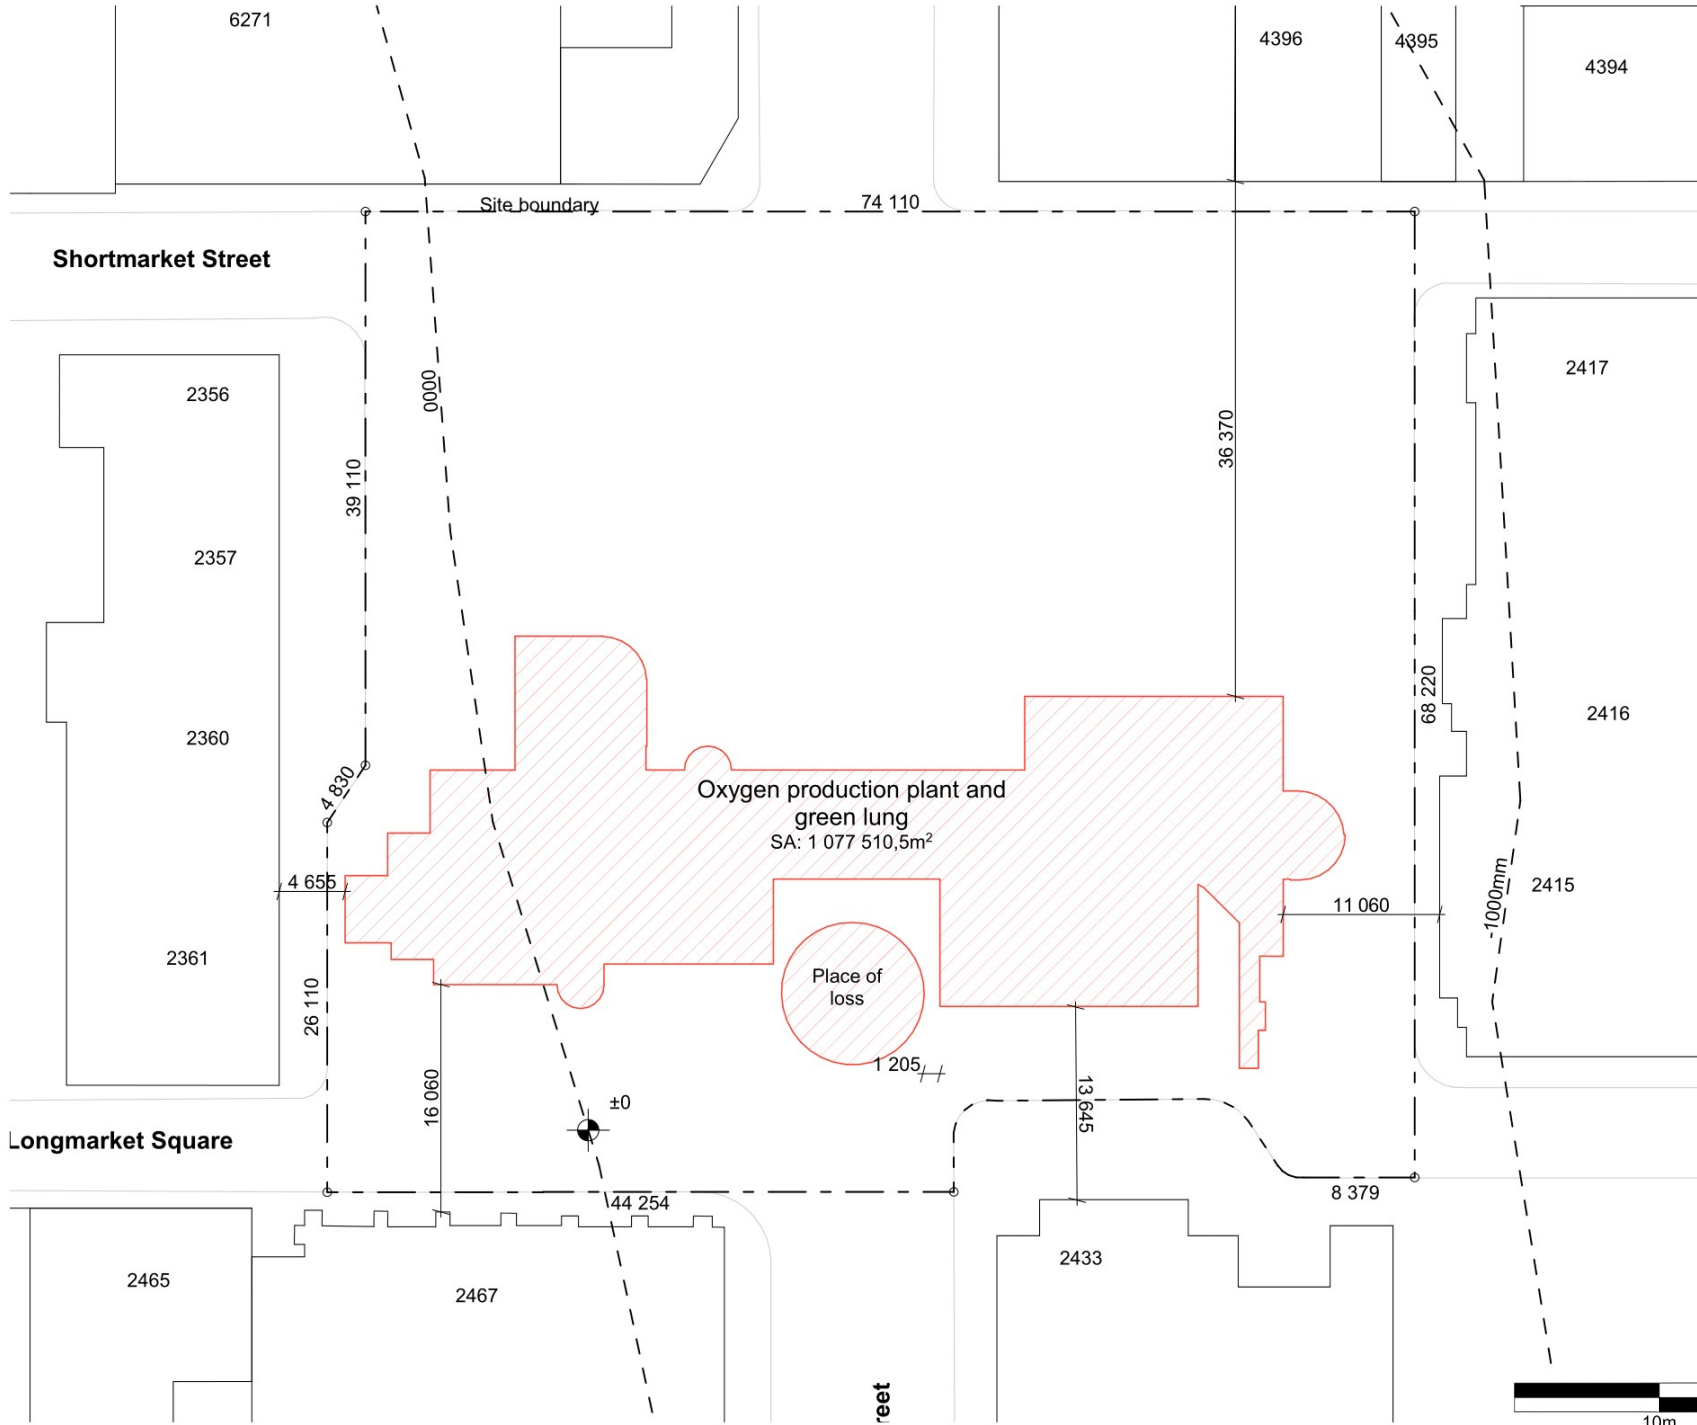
Construction drawings of Locality and Context plan (Author).
